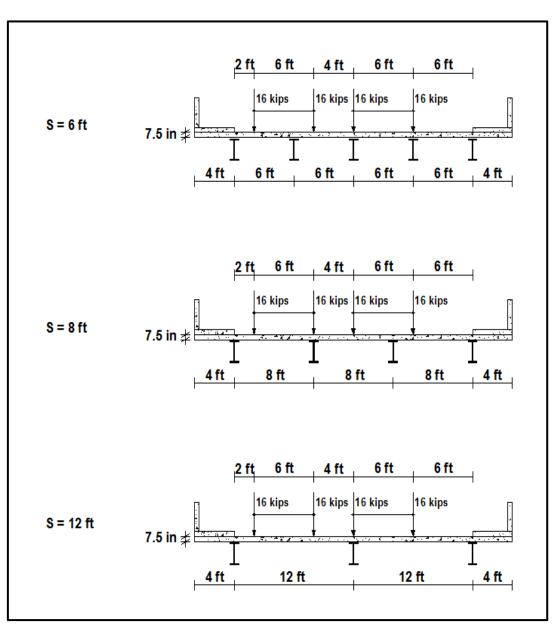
Typical Cross-Section of Two-Lane Bridges (Case 2SR) and the Critical Transverse Position of HS20 Trucks for the Different Girder Spacing Considered
